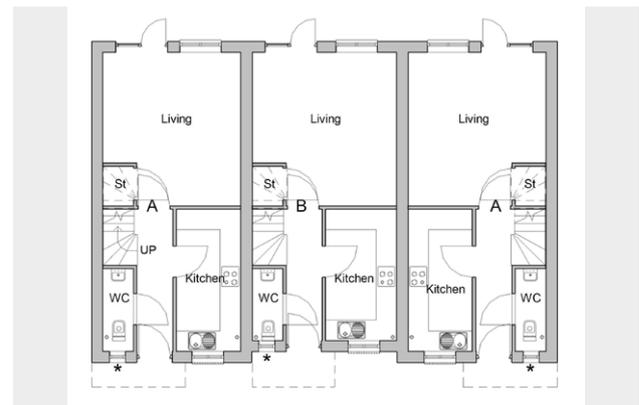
Proposed Housetype Block A (smallest housetype) measuring 4.5m wide by 9.1m deep.
